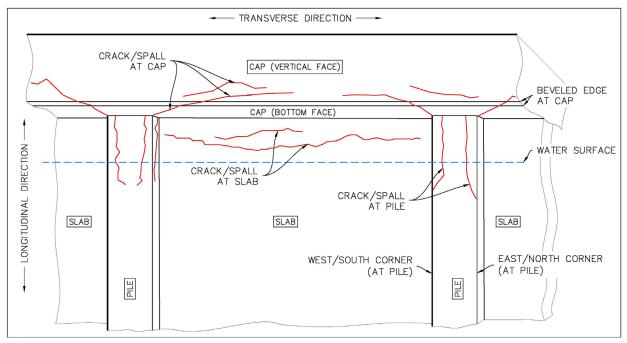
Typical Location of Cracks/Spalls at Pile, Slab, and Cap. Typical Failure Modes at Pile.
